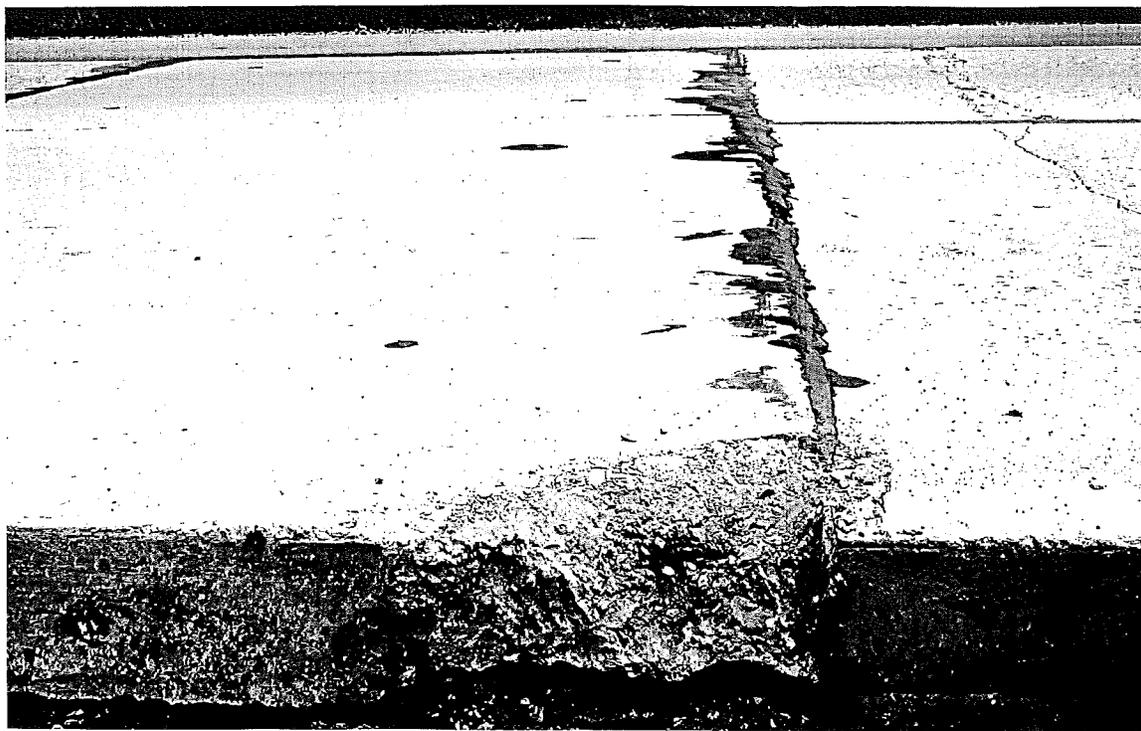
General view of precast slab repair at Sta. 1436+20 (northbound) showing high side and damaged corner.
